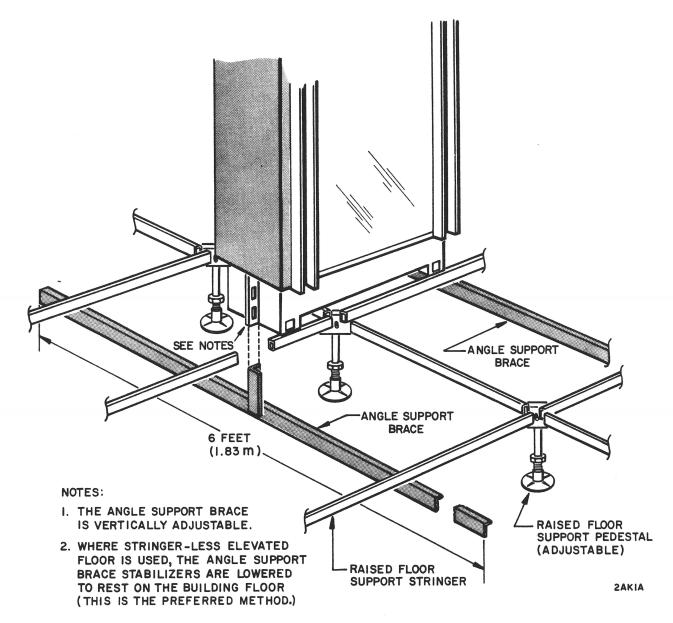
7611-1 Equipment Controller, Angle Support Bracing
